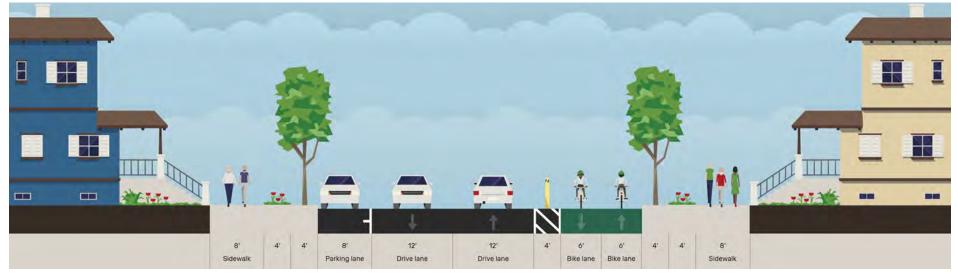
Multi-Use Path on One Side with Parallel Parking (60' ROW, 40' Curb to Curb)
